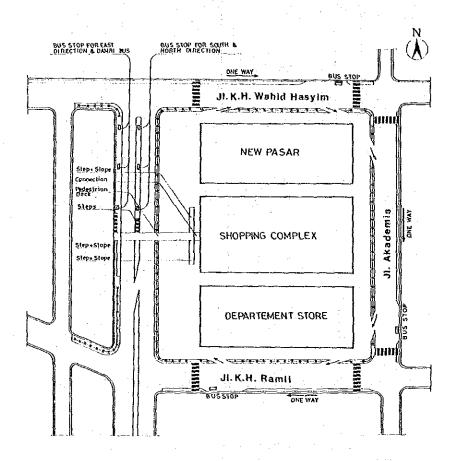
Pasar Sentral Sub-Terminal Improvement Plan (Step 2)
